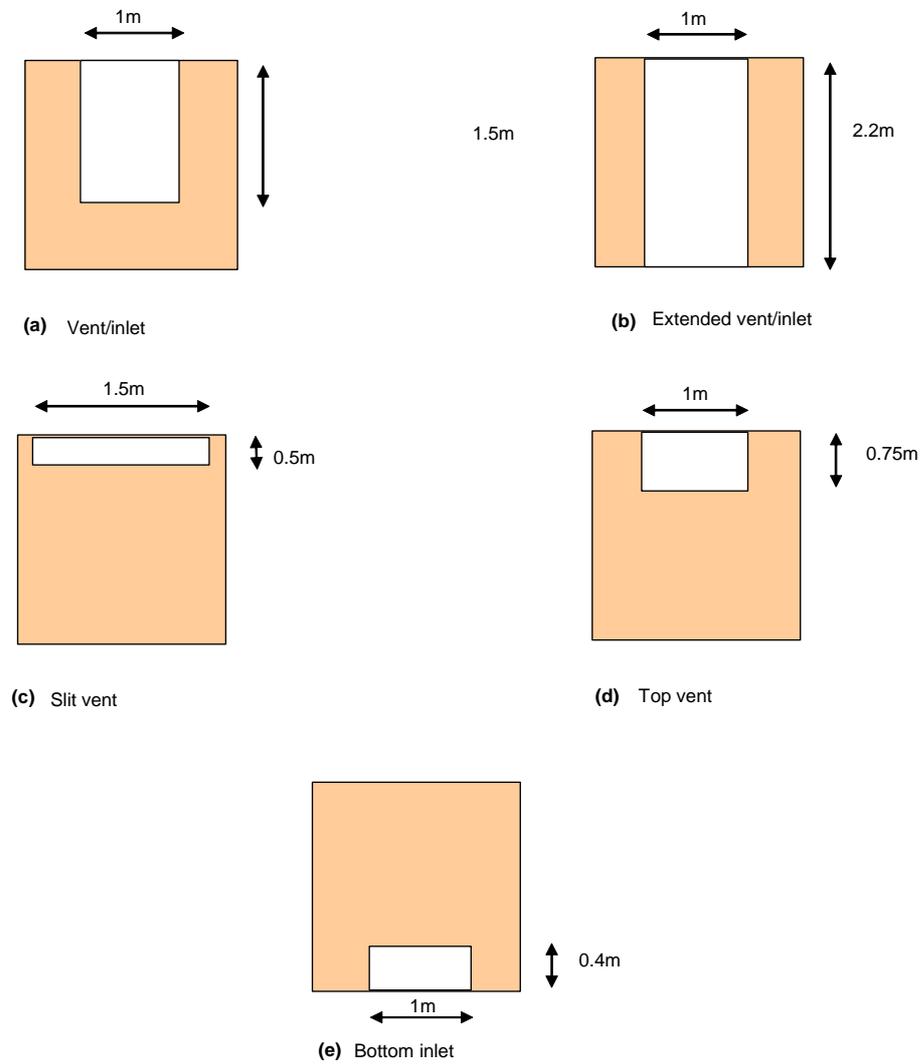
Types of ventilation and inlet openings used in corridor and lobby (full-scale dimensions shown)
